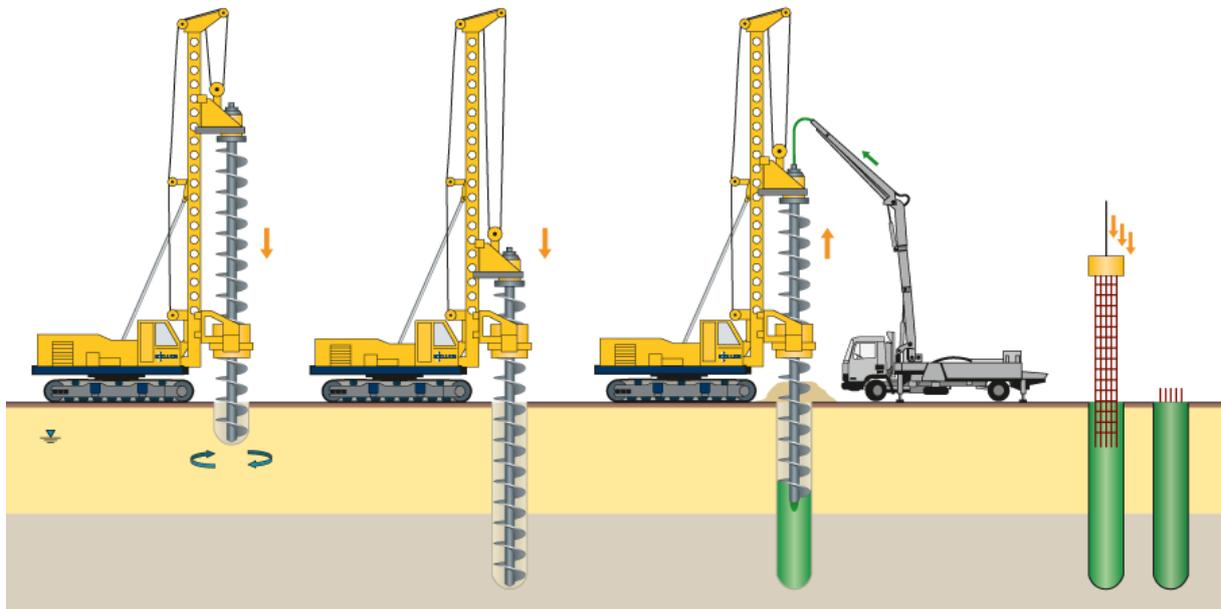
Mini CFA piles (<http://www.kellerholding.com/bored-piles.html>)
